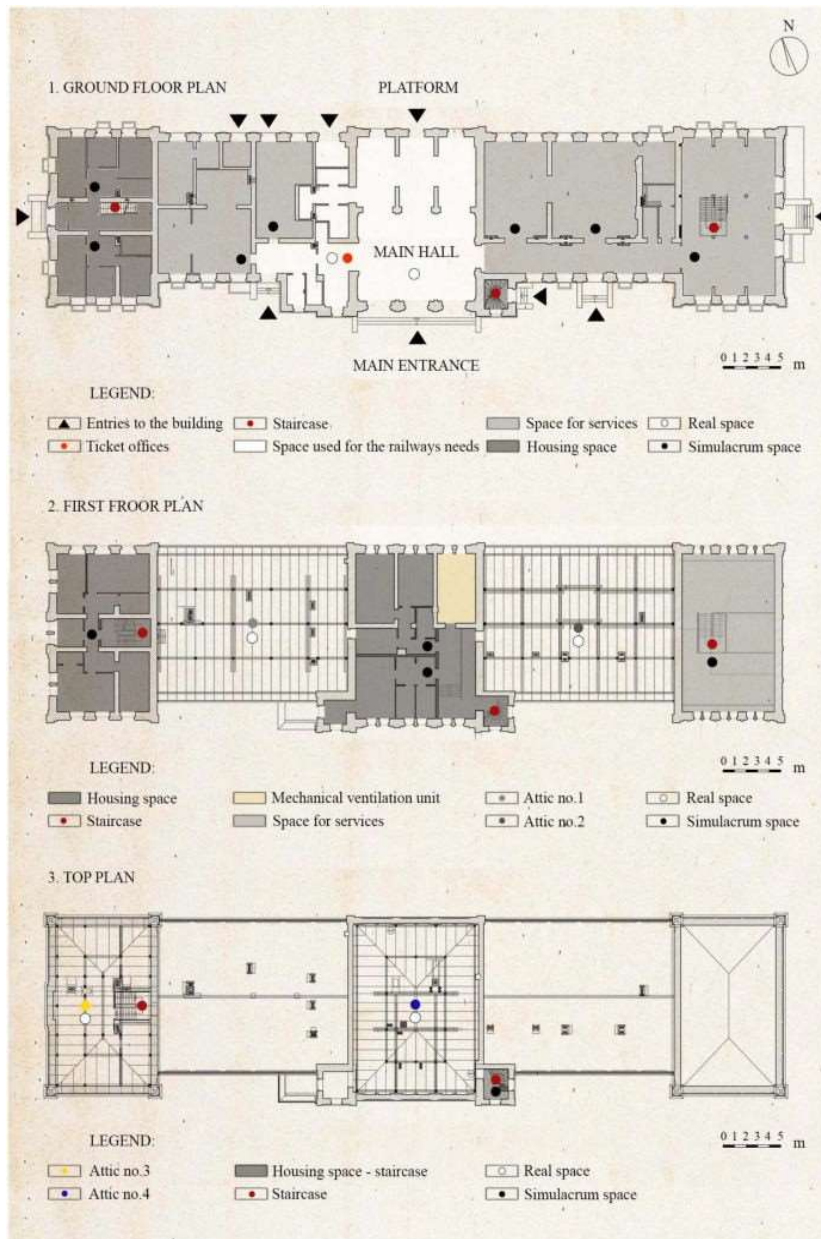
Analysis of the space of the railway station building, 1-ground floor plan;
